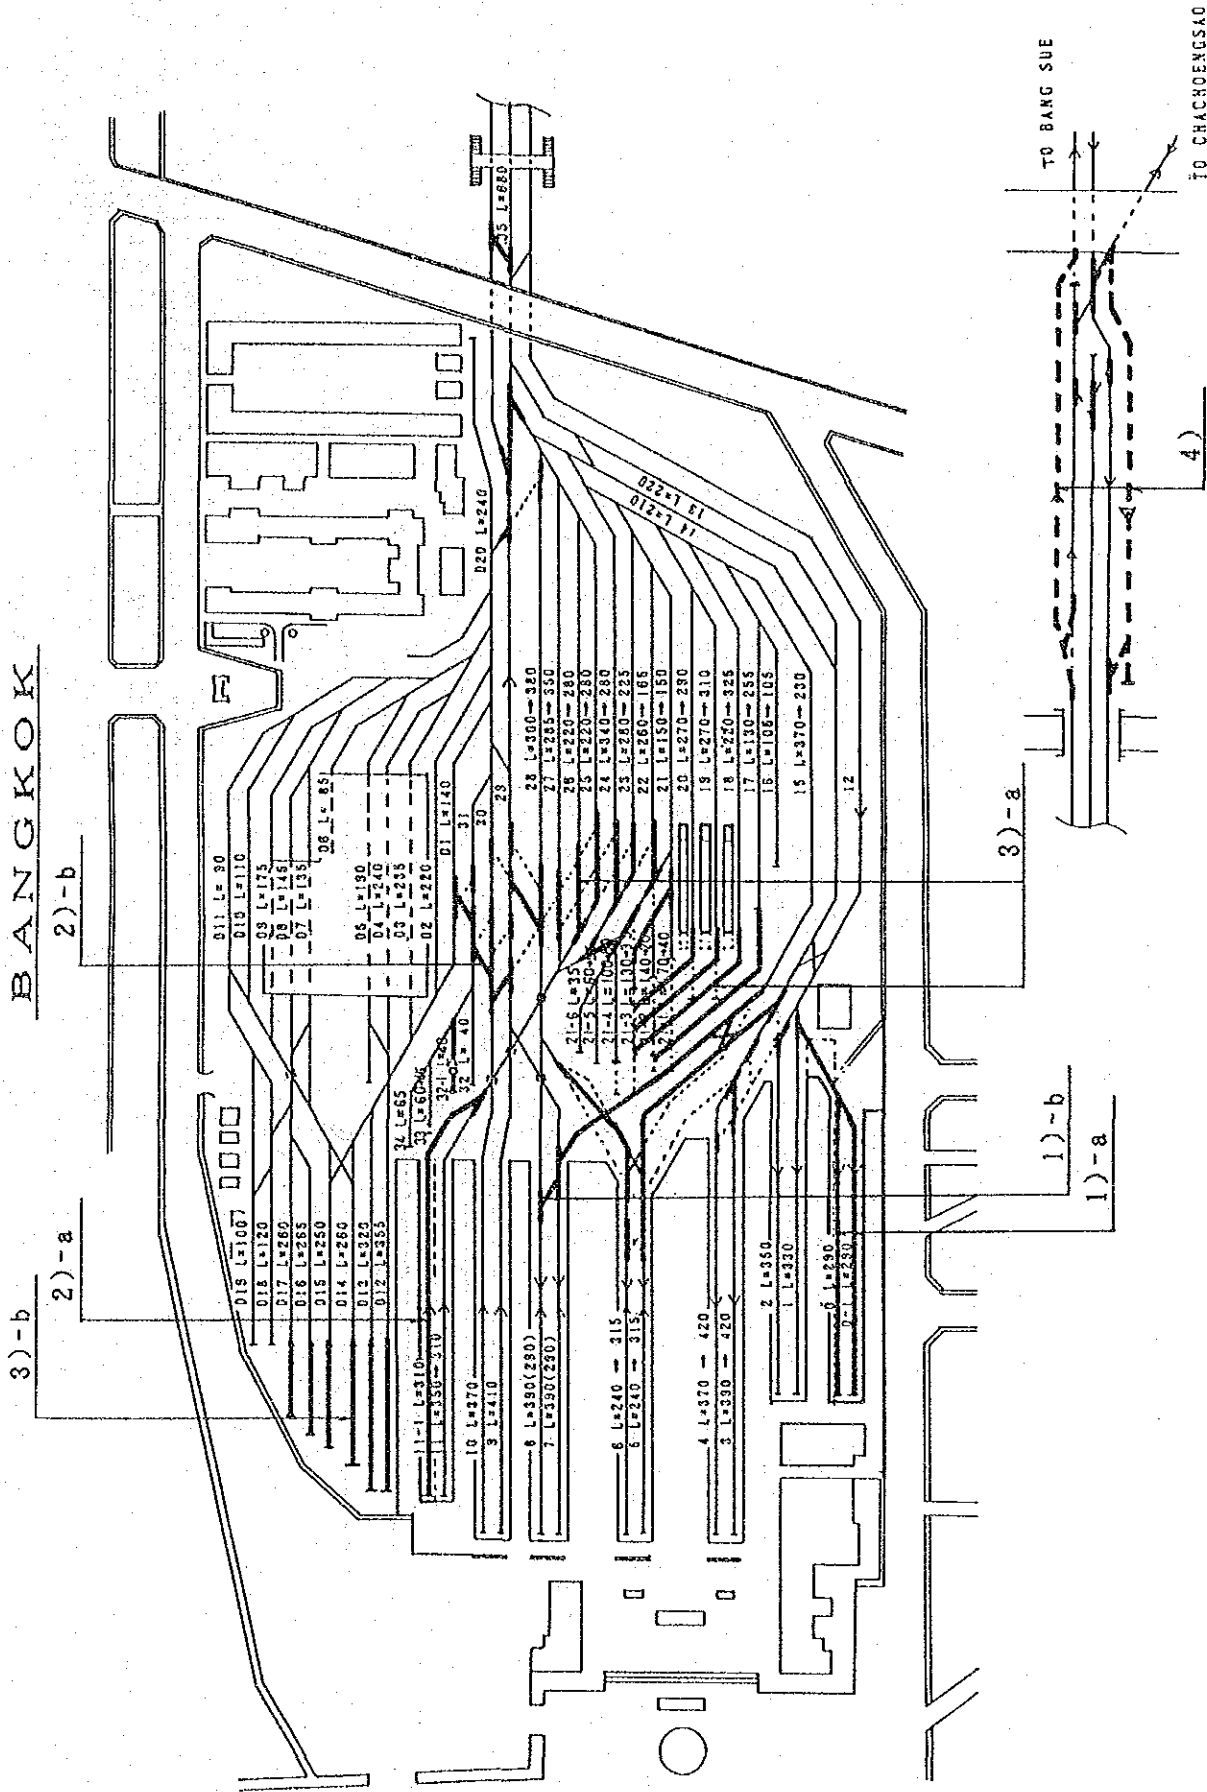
Future Track Layout at Bangkok Station (Master Plan)
